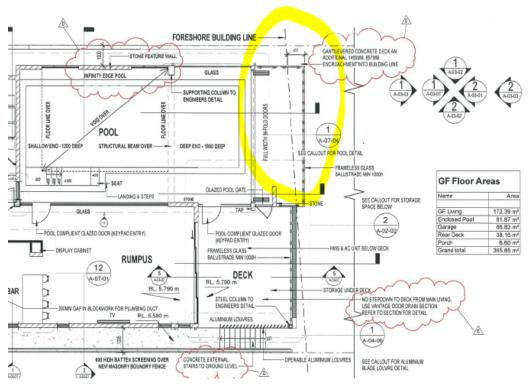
Proposed ground floor modification plan (revised deck structure highlighted yellow)
